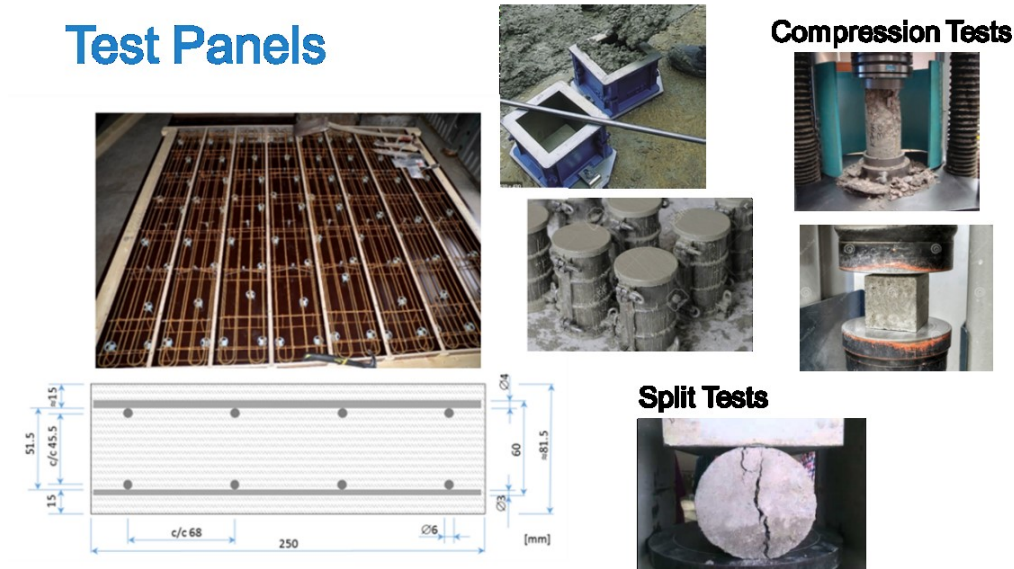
The test object dimensions and reinforcement, together with the cube and cylinder specimens for the compression and splitting tests of the concrete for the test series.
